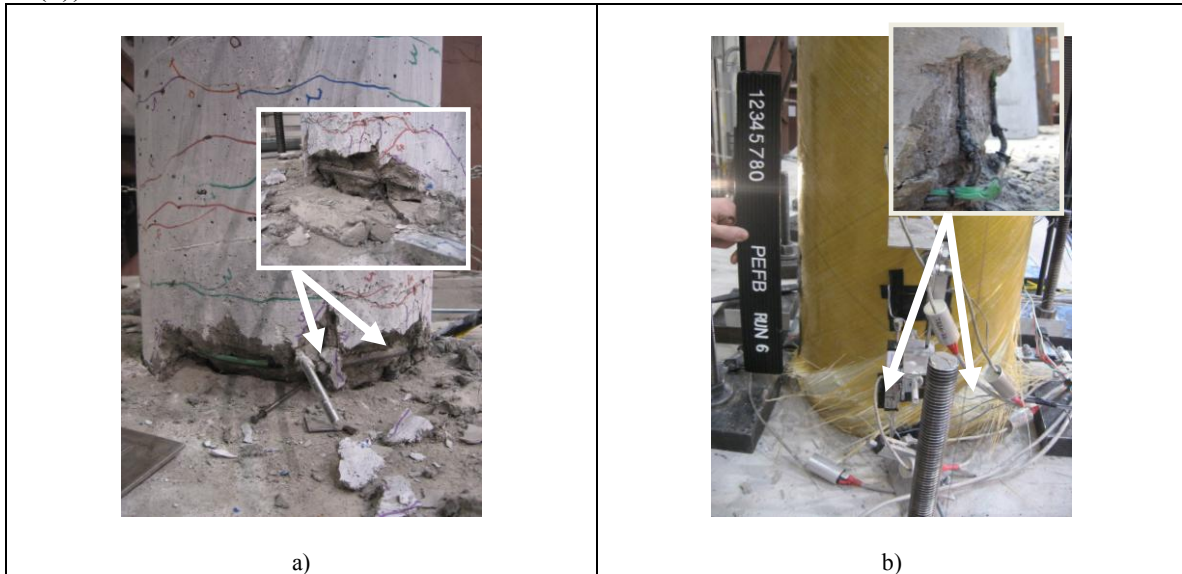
Apparent Damage at Failure Point in a) RC-ECC Column, b) FRP Column
